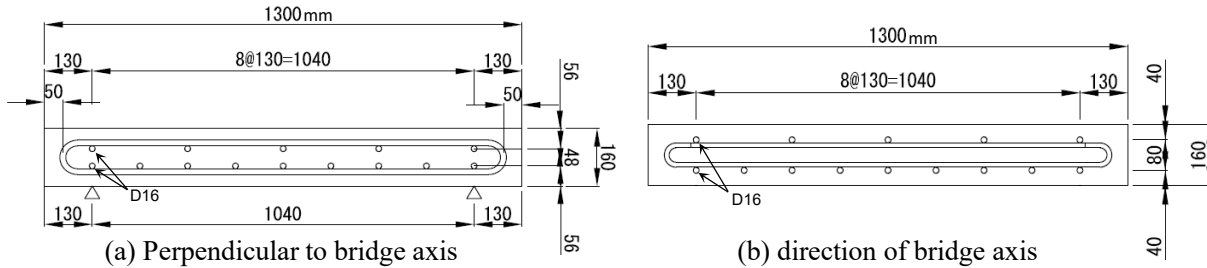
The shape, dimensions and reinforcing bar arrangement of the slab specimen
